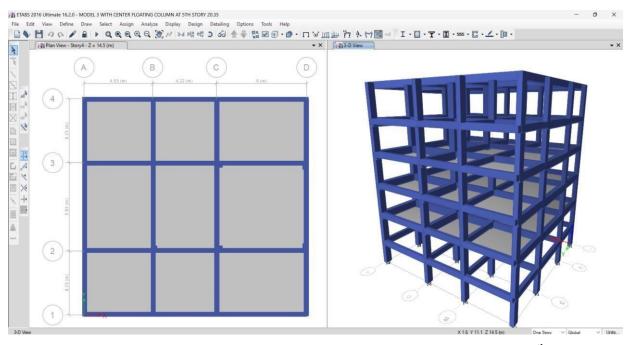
Model 3 – Plan & 3D view of Building with centre floating column at 4th story
